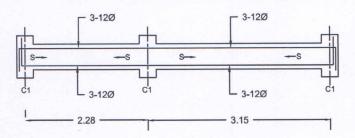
DETAILED DRAWING OF REINFORCEMENT OF BEAMS AT PLINTH/ROOF LEVEL
